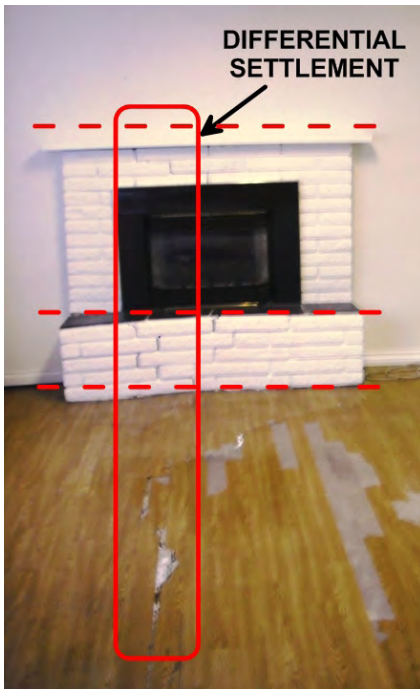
Example of differential settlement manifested in a brick fireplace and wood flooring.
